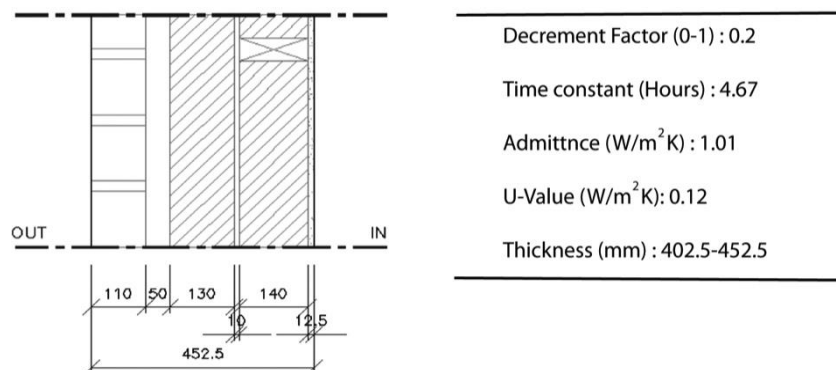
From Out to in: 110mm Brick Outer Leaf, 50mm Air Gap, 130mm Rockwool, 10mm Plywood, 140mm Rockwool, 12.5mm Plasterboard
